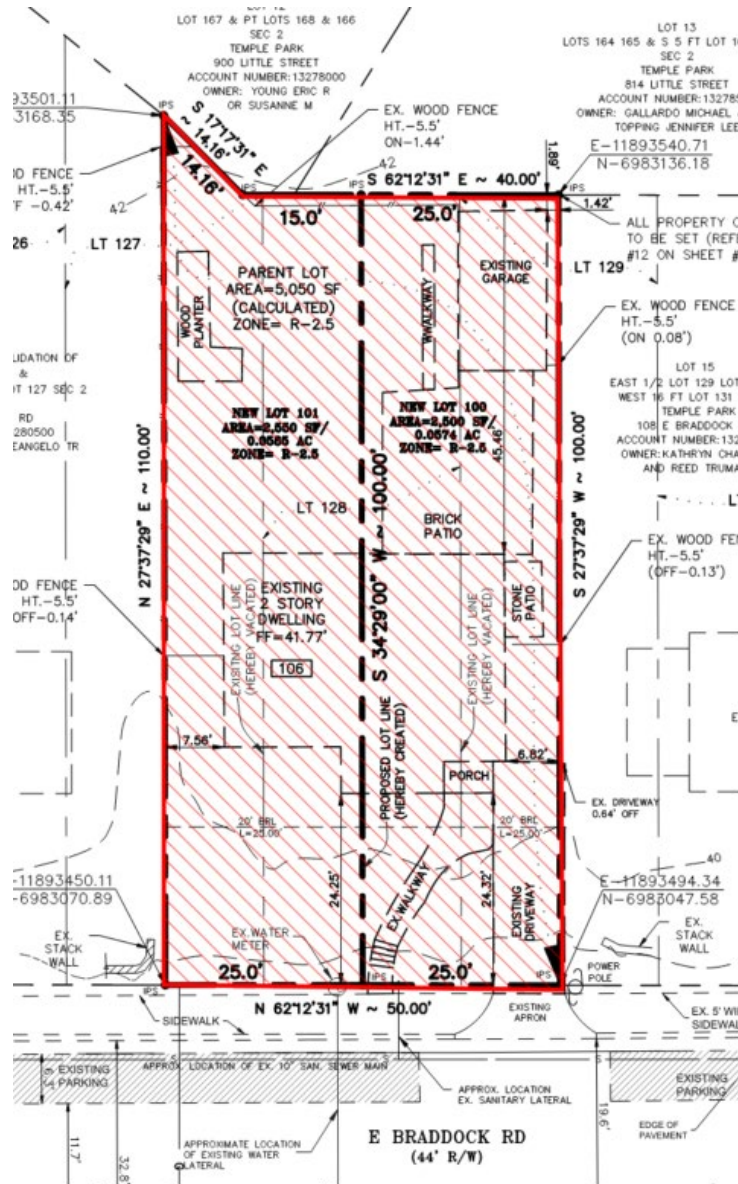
Existing Lot Configuration (east half of lot 127, all of lot 128, and west half of lot 129)
